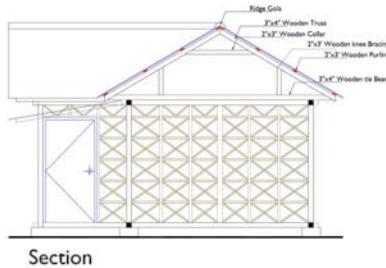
Typical side elevation of an engineered Dhajji building after the 2005 Pakistan earthquake.
